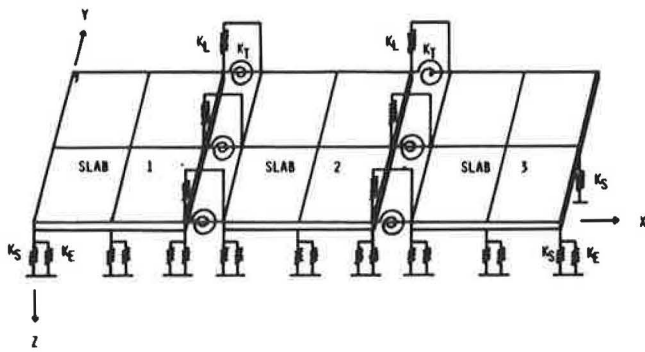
Finite-element modeling of a three-slab pavement system.
